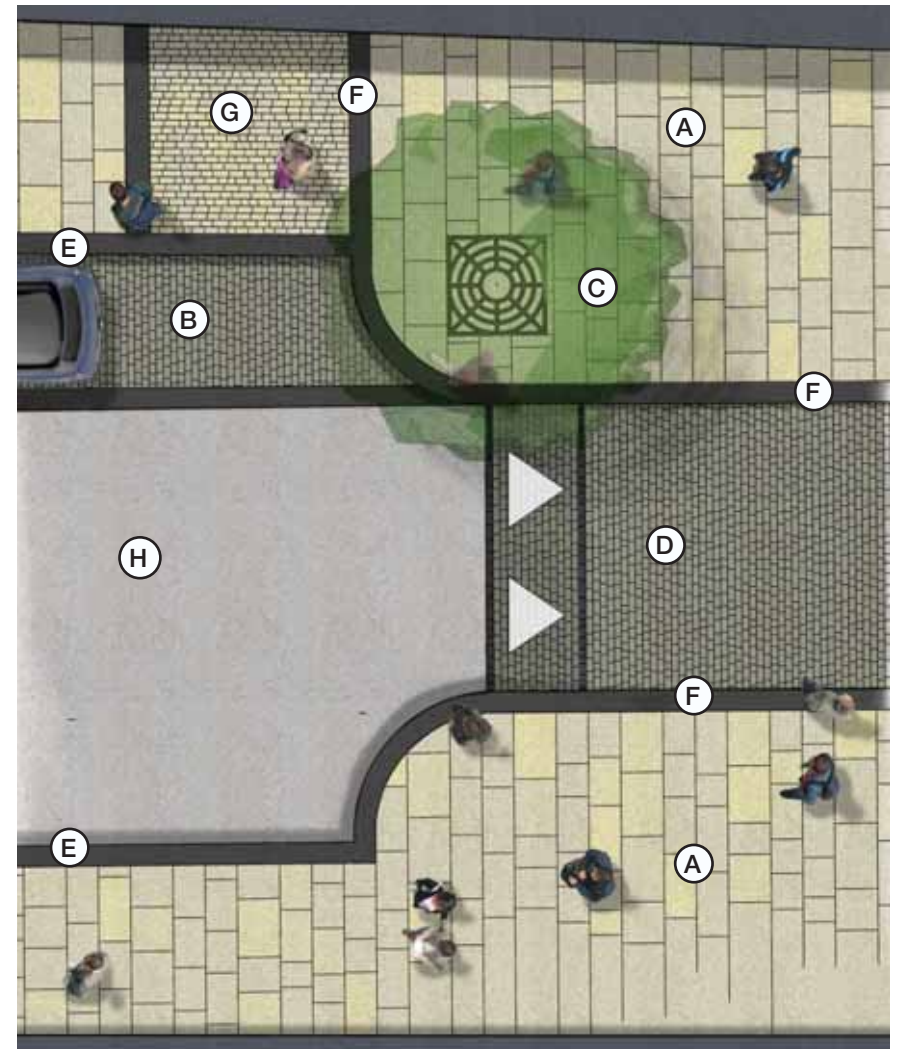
Concept sketch plan illustrating layout and materials of the street (Example Fore St.)
